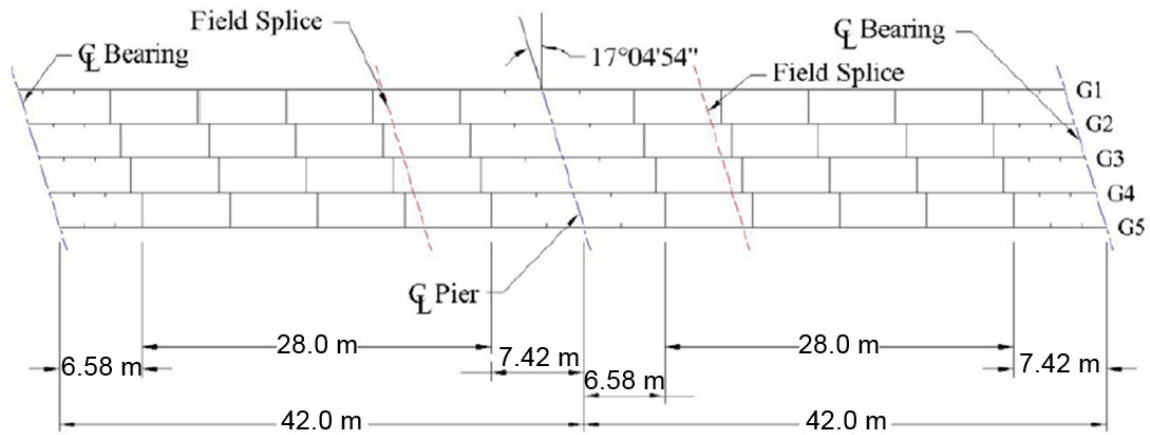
Missouri bridge A-6101 framing plan (Reproduced from Wu 2003)
